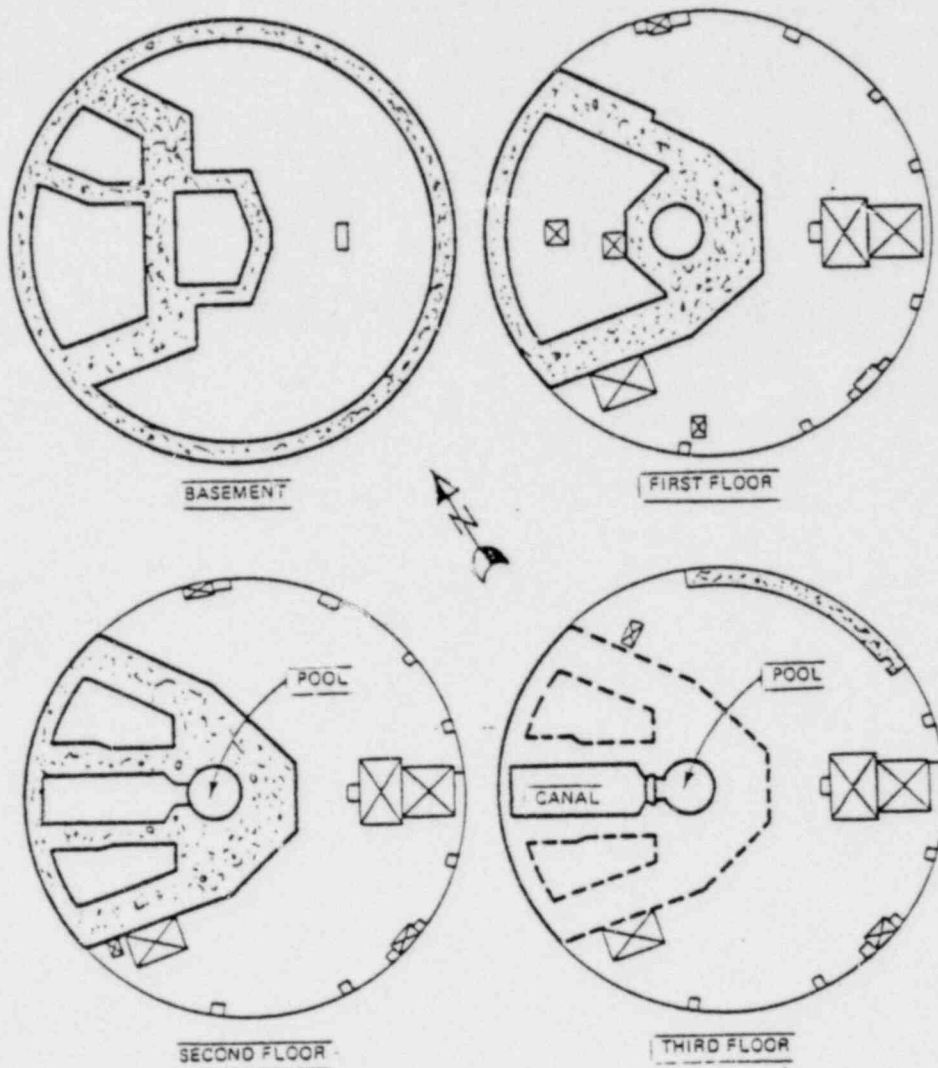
REACTOR BUILDING FLOOR PLANS
